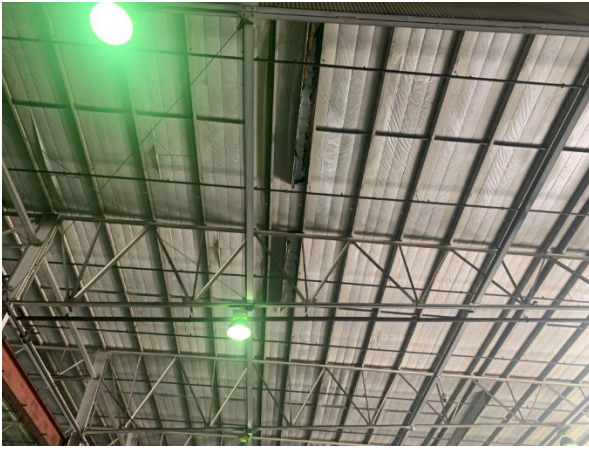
Scrim face on the batt insulation is damaged and falling away from the roof. Scrim face acts as the vapor barrier to stop water from entering the insulation and condensing causing damage.
